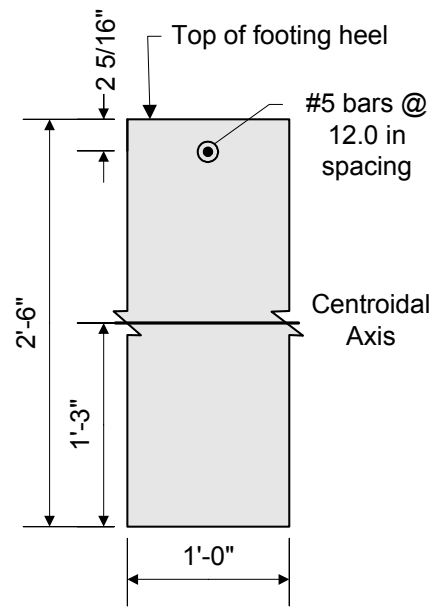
Abutment Footing Heel Cracking Moment Dimensions
